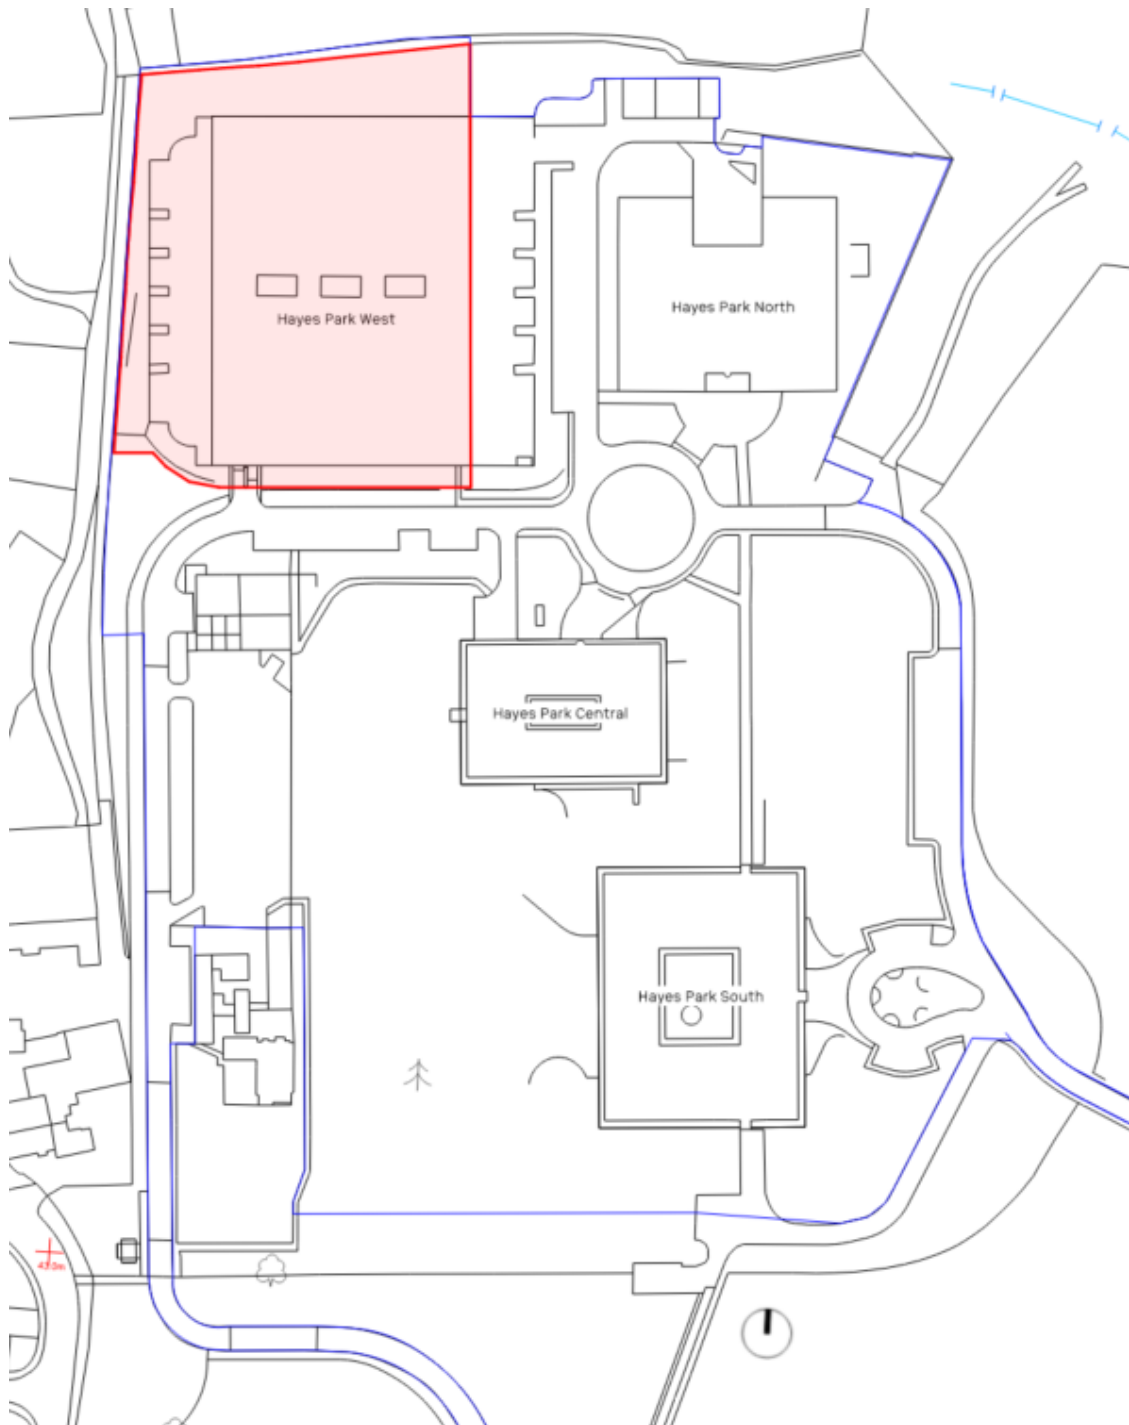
Application site plan; Hayes Park West (HPW) boundary in red highlight – subject to this statement. Hayes Park masterplan boundary in blue line.
